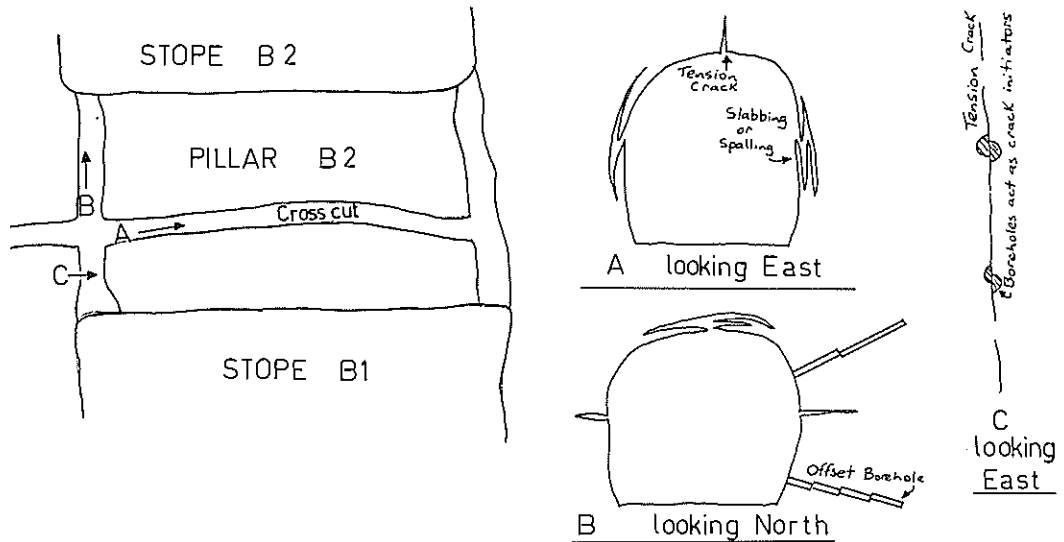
SKETCHES OF TYPICAL FAILURE PHENOMENA IN RIB PILLAR B.2
